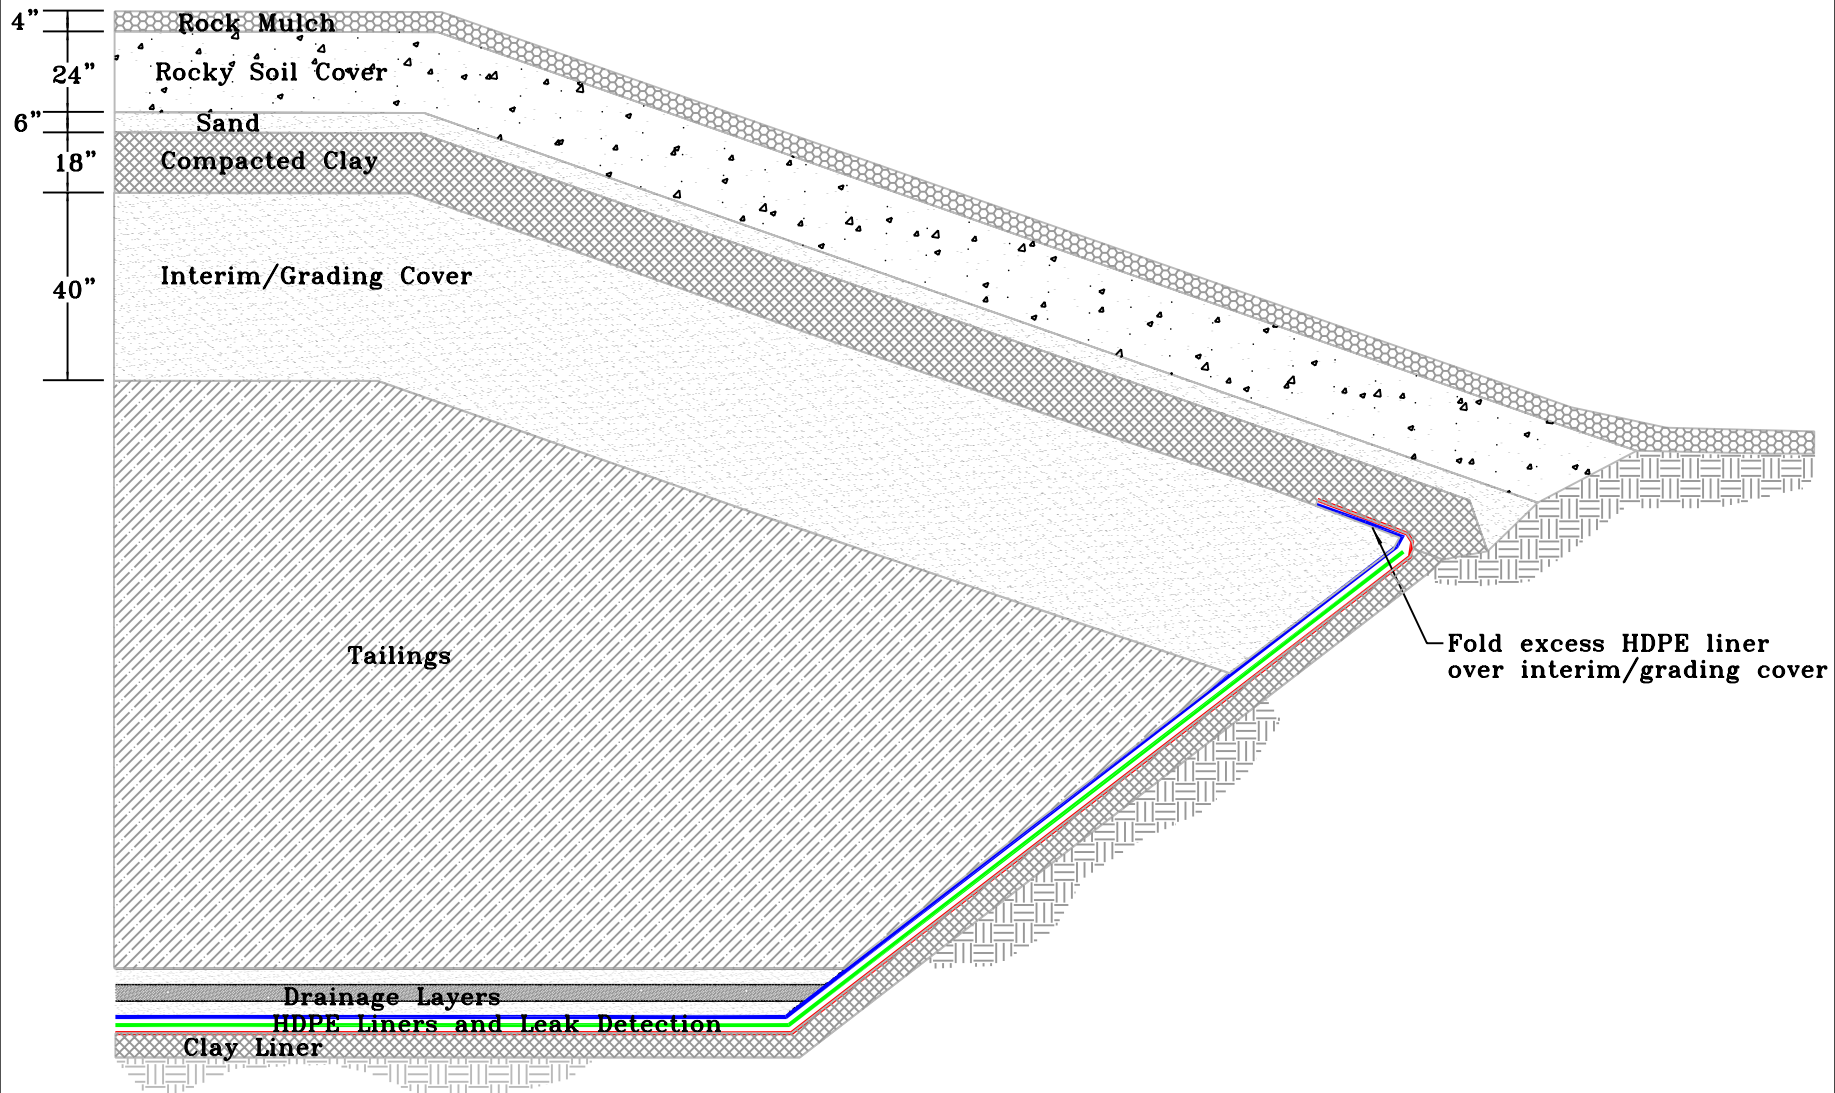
CENTER CROSS SECTION THROUGH SHOOTARING DAM
